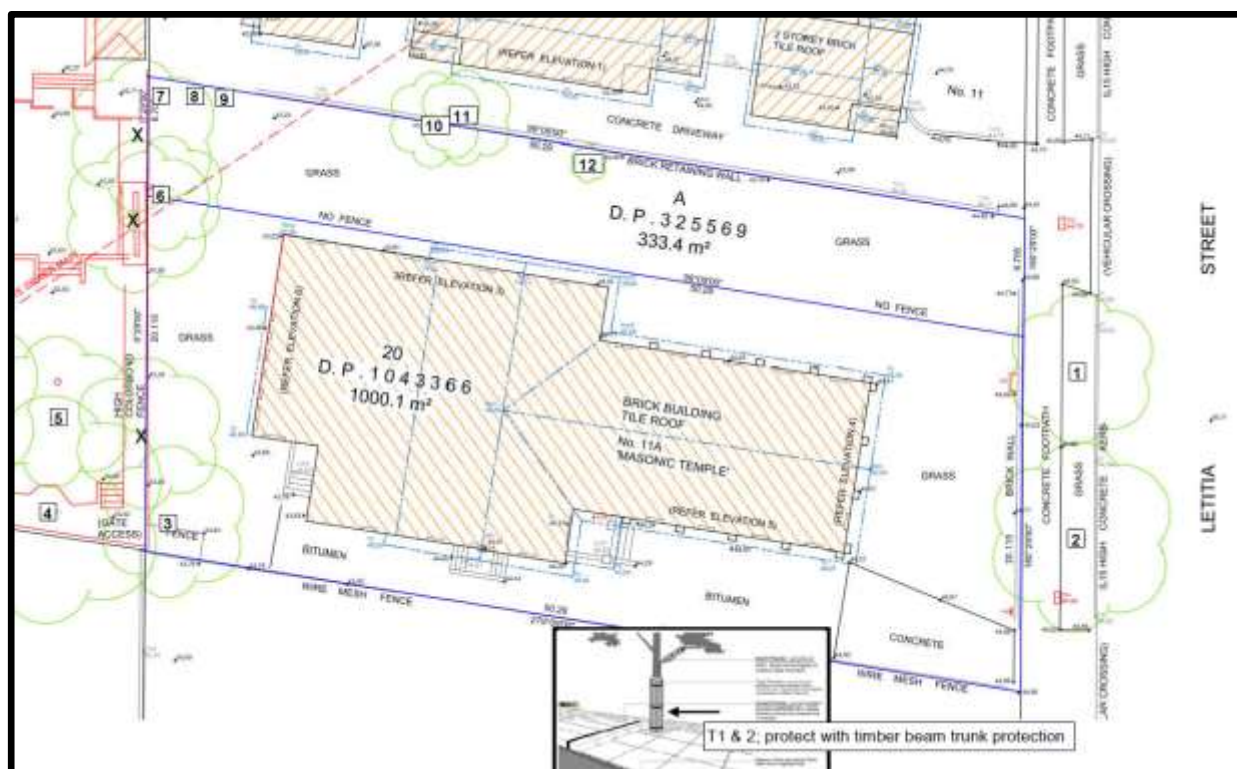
Tree location plan (courtesy: rain tree consulting, 2021)
